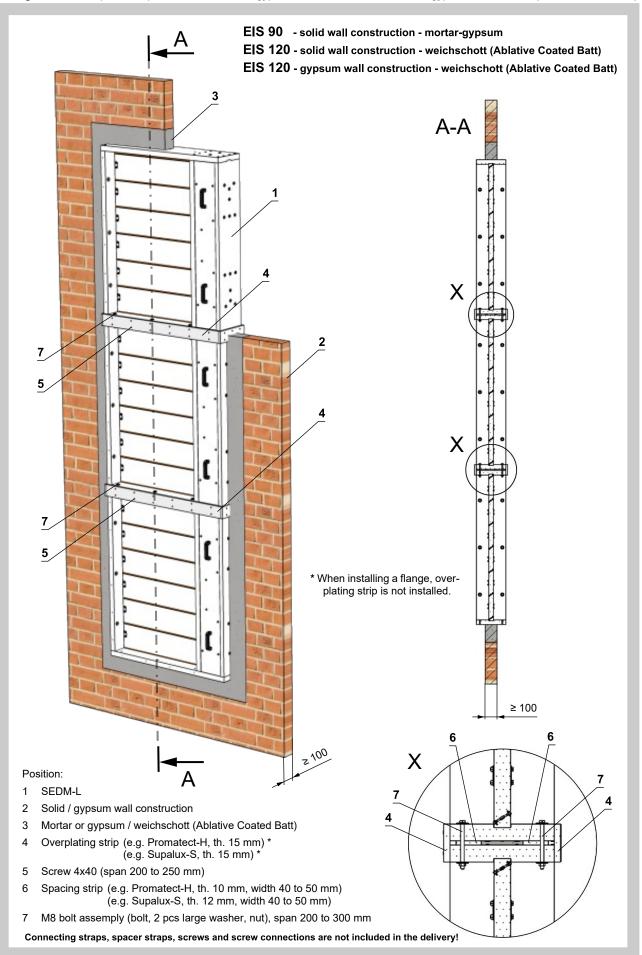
3 dampers on top of each other - solid / gypsum wall construction - mortar or gypsum / weichschott (Ablative Coated Batt)
